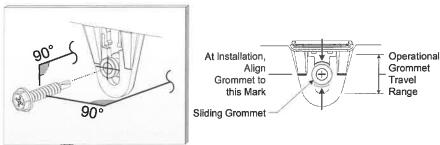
Supplied Mounting Hardware – Drive the screw at a right-angle to the VAV Box
